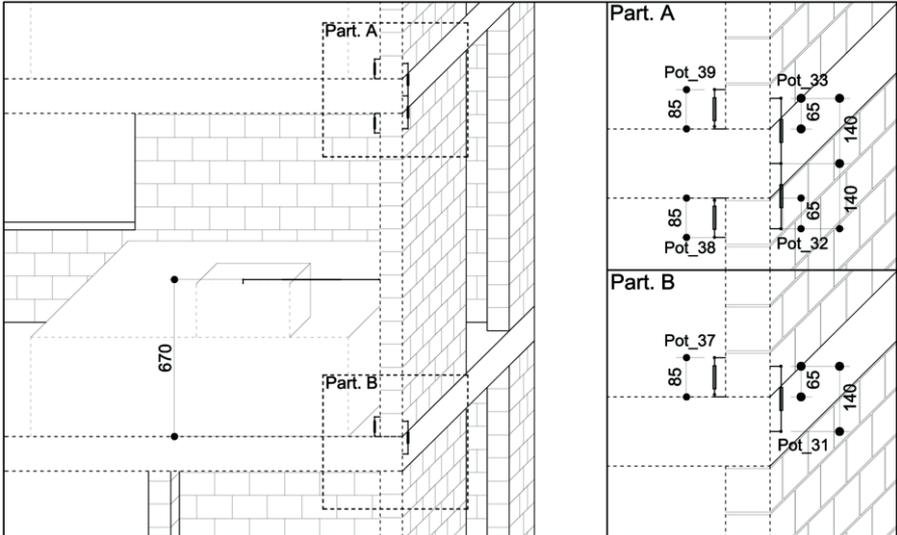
Potentiometers configuration for the measure of the deformations of the 2<sup>nd</sup> storey out-of-plane loaded URM walls on the North face of the building, measures in mm.
